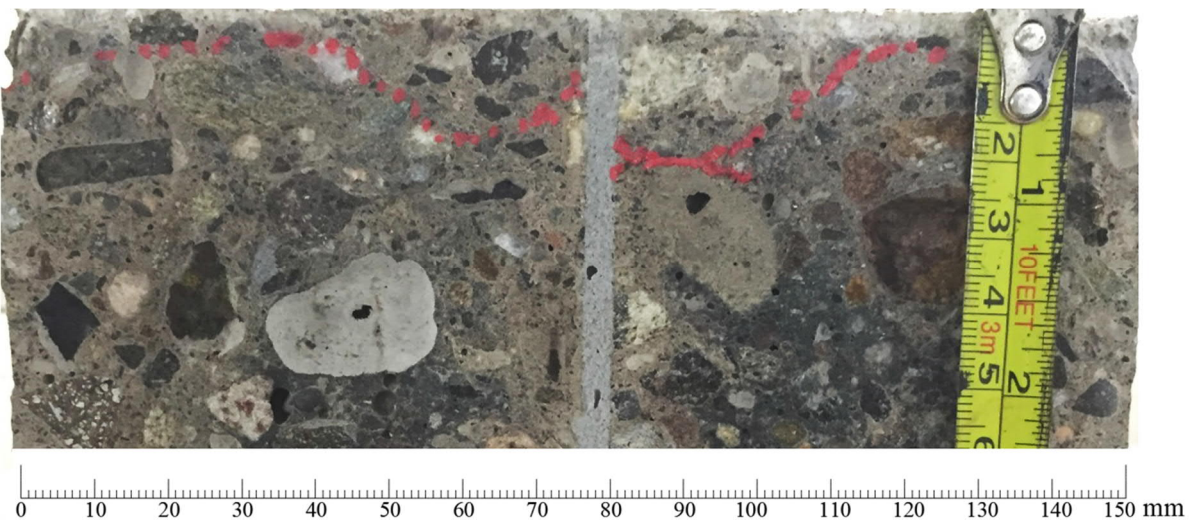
Rare case of water ingress through hard-hard concrete bond
